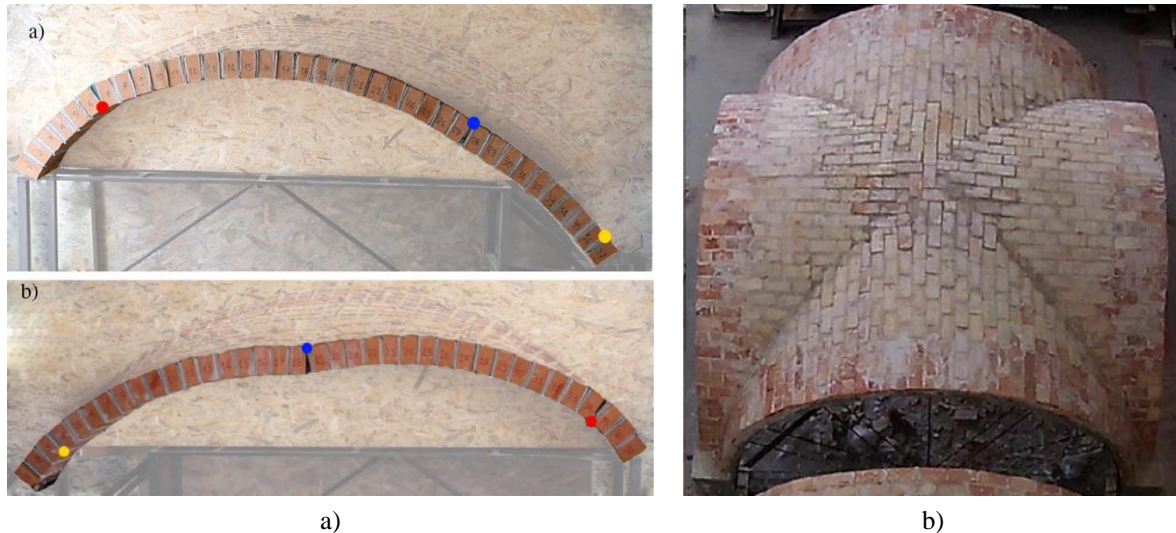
Experimental test on full-scale models of arches and vaults on moving supports: a) segmental brick arch subjected to vertical (top) and inclined (bottom) support displacements (Zampieri et al. 2018a), b) timbered brick cross vault subjected to vertical cyclic displacements of one support (Torres et al. 2019b).
